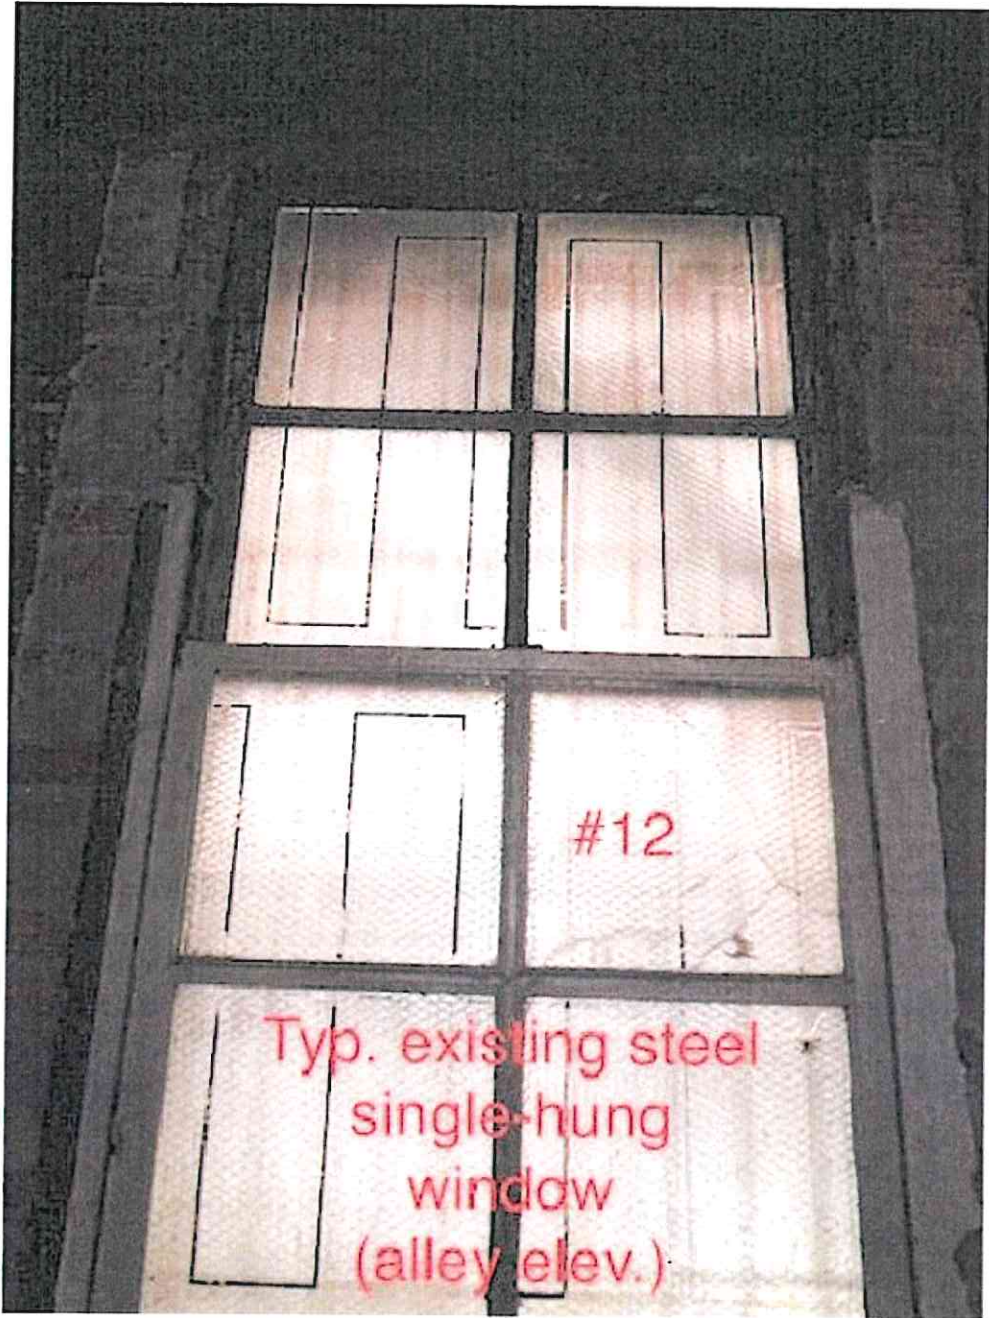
Interior view of steel window without stops. (Sashes built into master frame)
